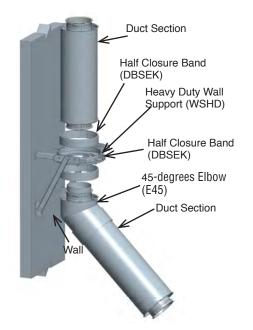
Elbow with an Heavy Duty Wall Support (HDWS)
